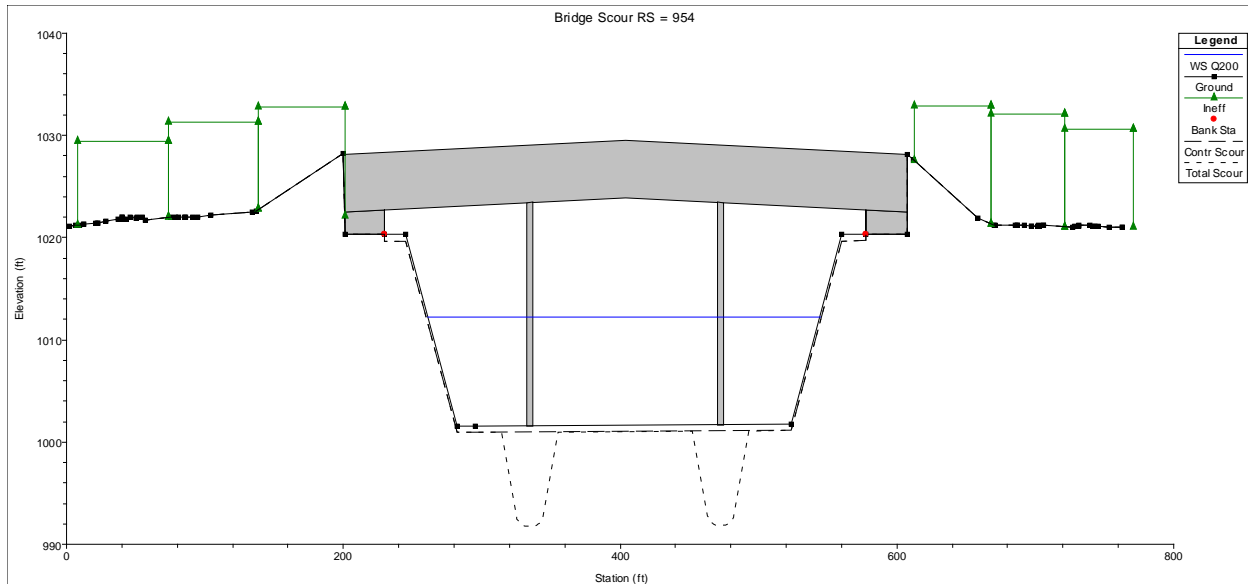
Scour of Proposed Bridge Piers in Ultimate Condition for Q200.
